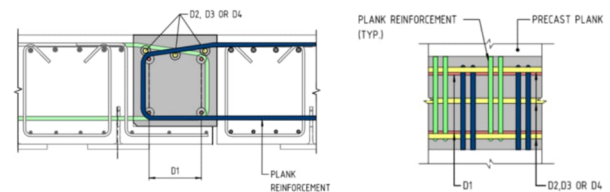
Overlapping transverse reinforcement in section and plan view on the drawings
